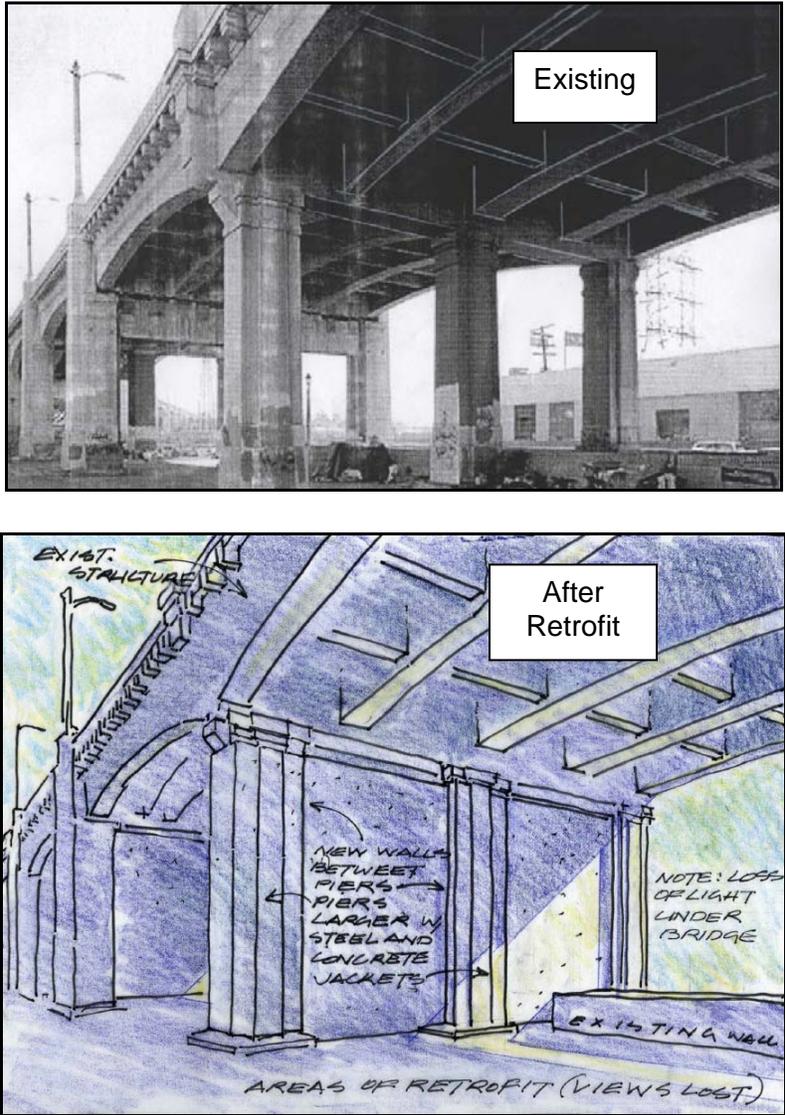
Conceptual Drawing Alternative 2 – Retrofit
